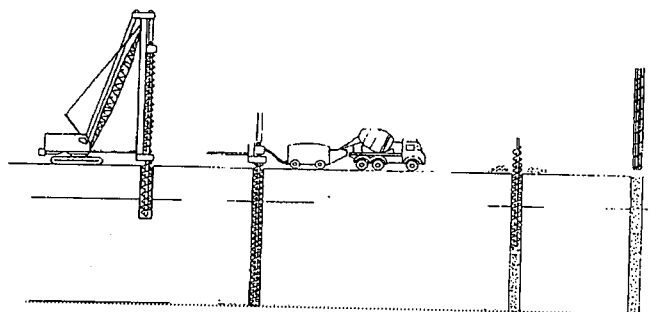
Stages of construction of a CFA bored pile, courtesy of Cementation, Piling and Foundations Ltd.
